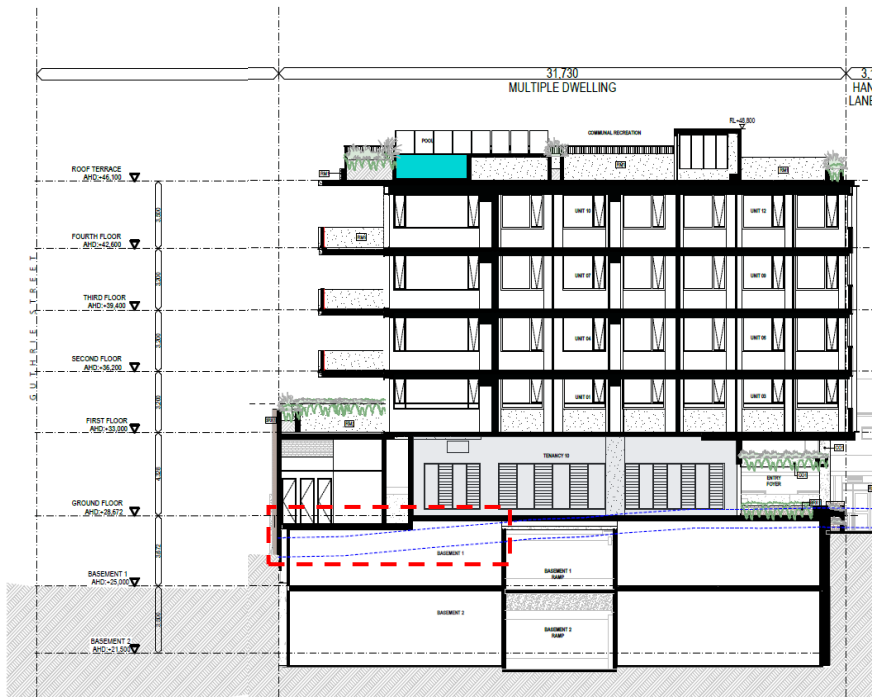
Proposed Section 4 (Drawing Ref: SD403) (Source: DAH Architecture, 2026)
